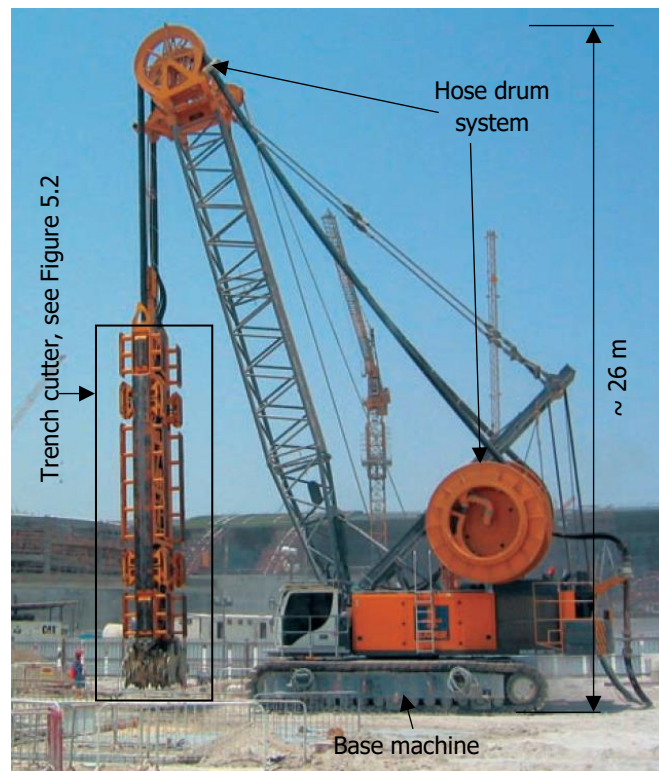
Side view of trench cutter system mounted on a MC 64 crawler crane with hose drum system (HDS) and height of approximately 26 m [34]. Figure 5.2 provides a detailed overview of the trench cutter components.
